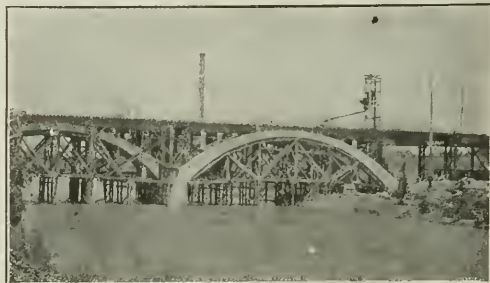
TWO ARCHES SPAN THE PLATTE RIVER
